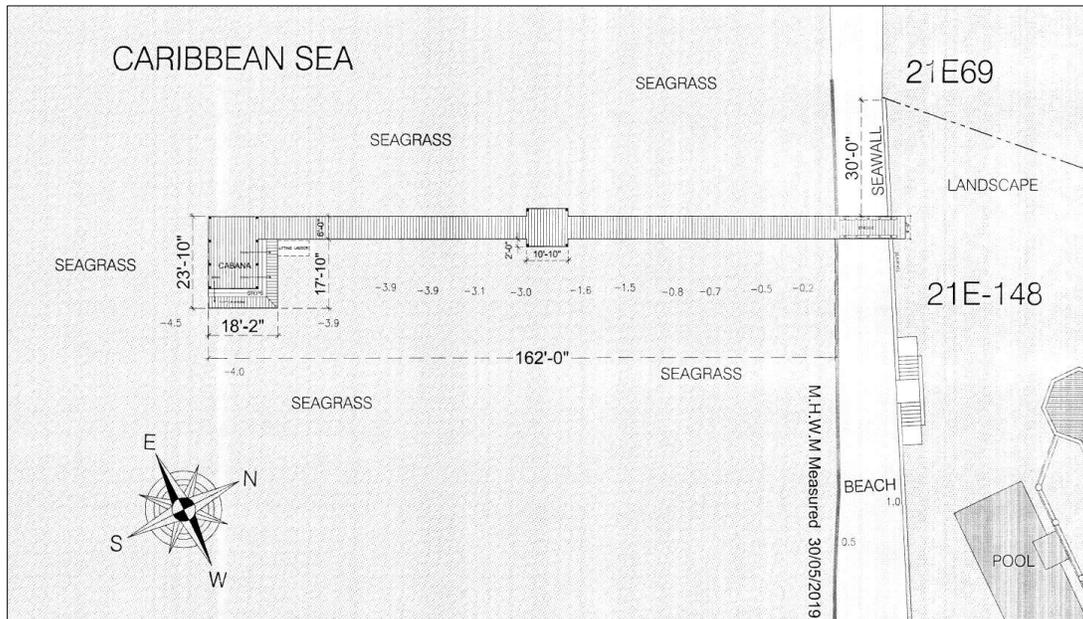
A PLAN EXTRACT SHOWING THE PROPOSED DOCK (SOURCE: ARCO 2019)
